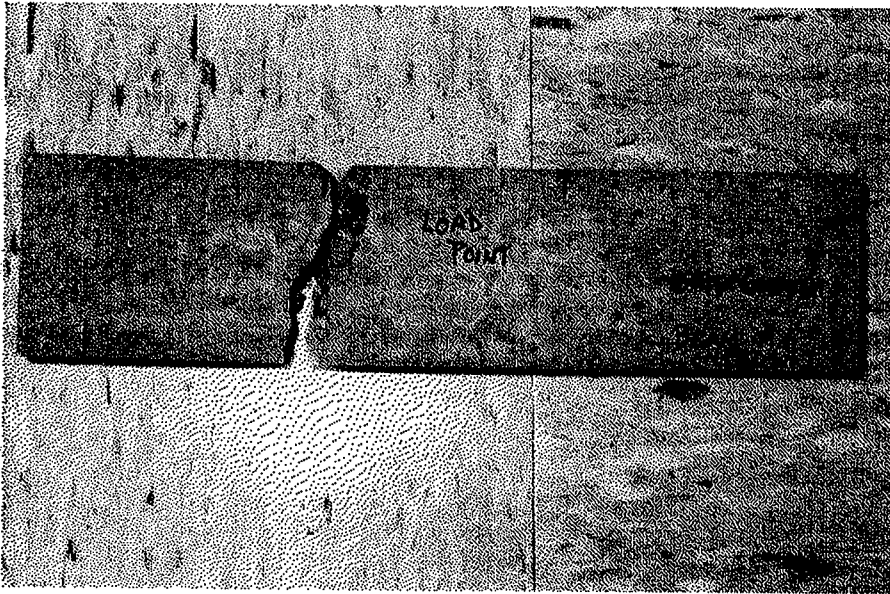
E.63.2. Tensile failure and vertical crack propagation in the thermally cycled beams without any laminate reinforcement.
